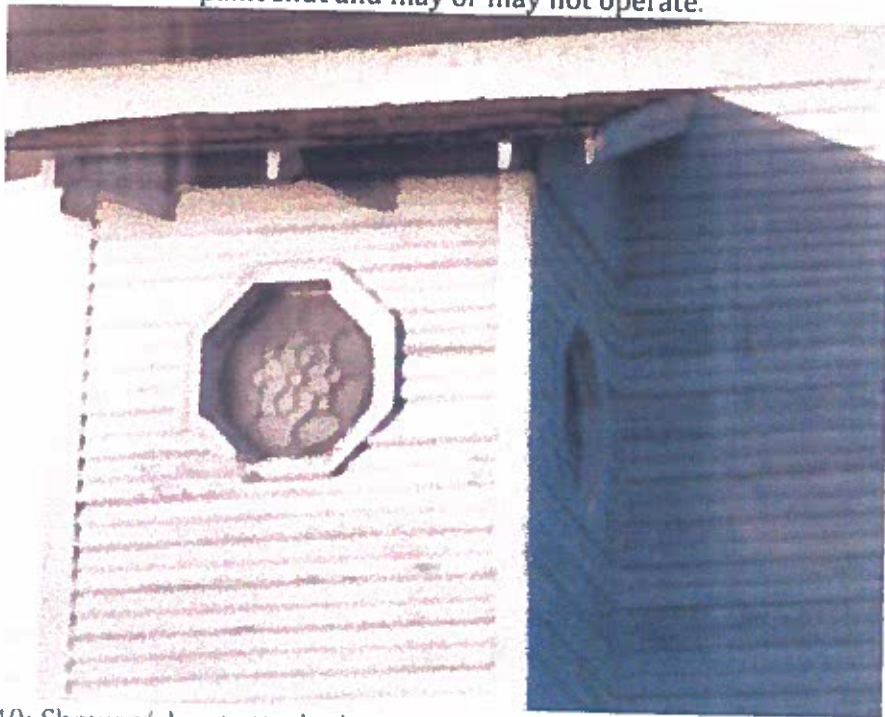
Shower/closet attached to south side of 2<sup>nd</sup> floor. The windows are fixed and can not be opened.
